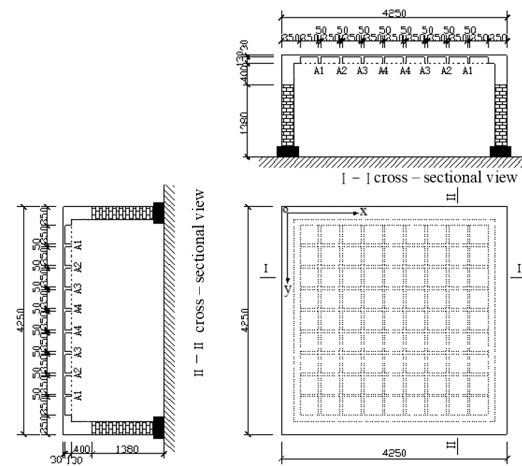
Plan and section of honeycomb core slab and waffle slab.
